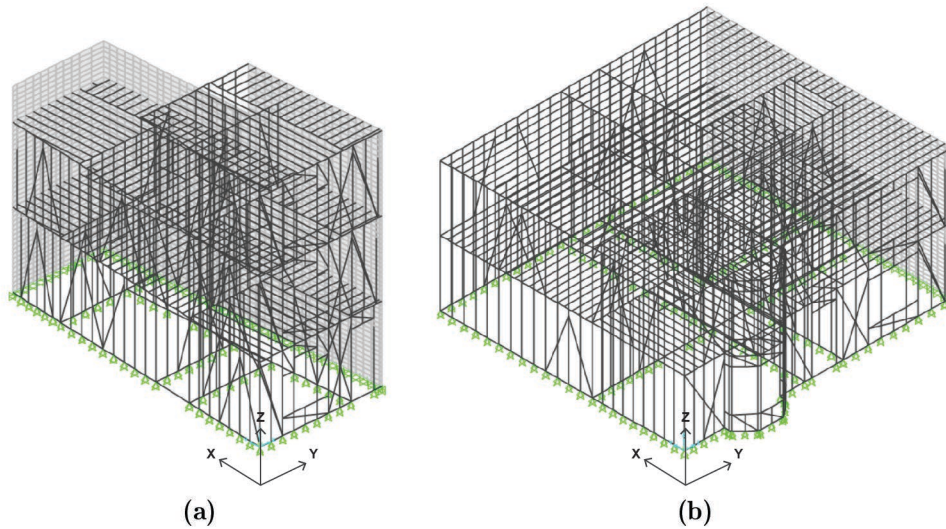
Numerical models of (a) Building 1 and (b) Building 2.
